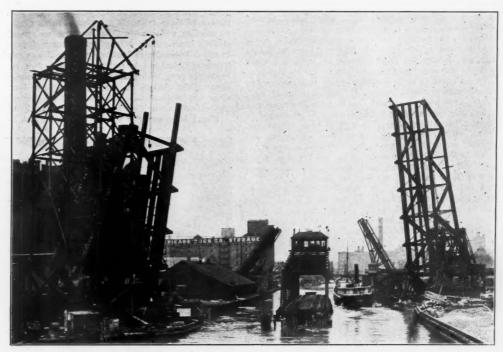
East Half of Bridge Erected—West Half During Erection.
